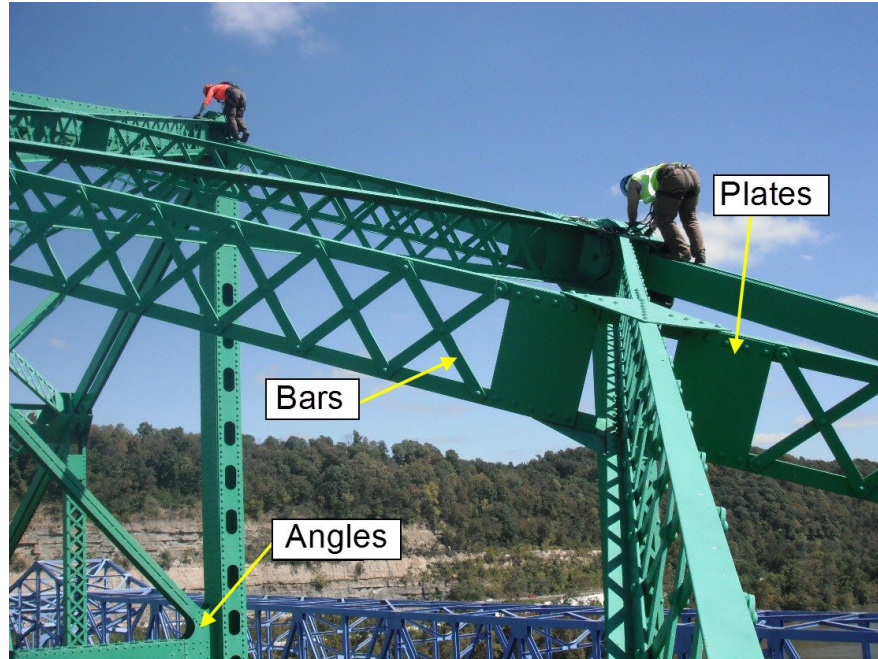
Bracing Members Made from Angles, Bars, and Plates
